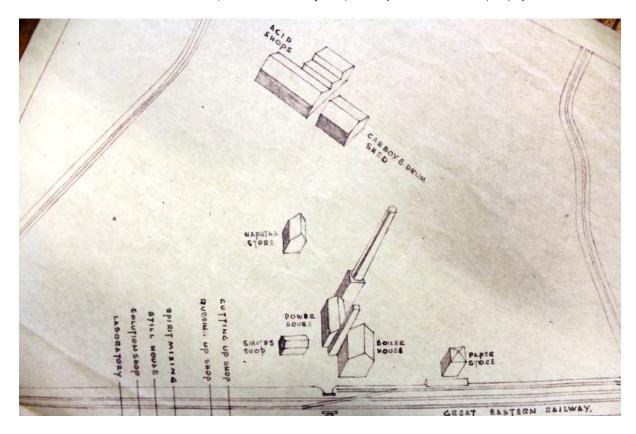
Plan of Brantham Works, south of railway line, 1905 (SRO Ref. HC 410/A7/8)
